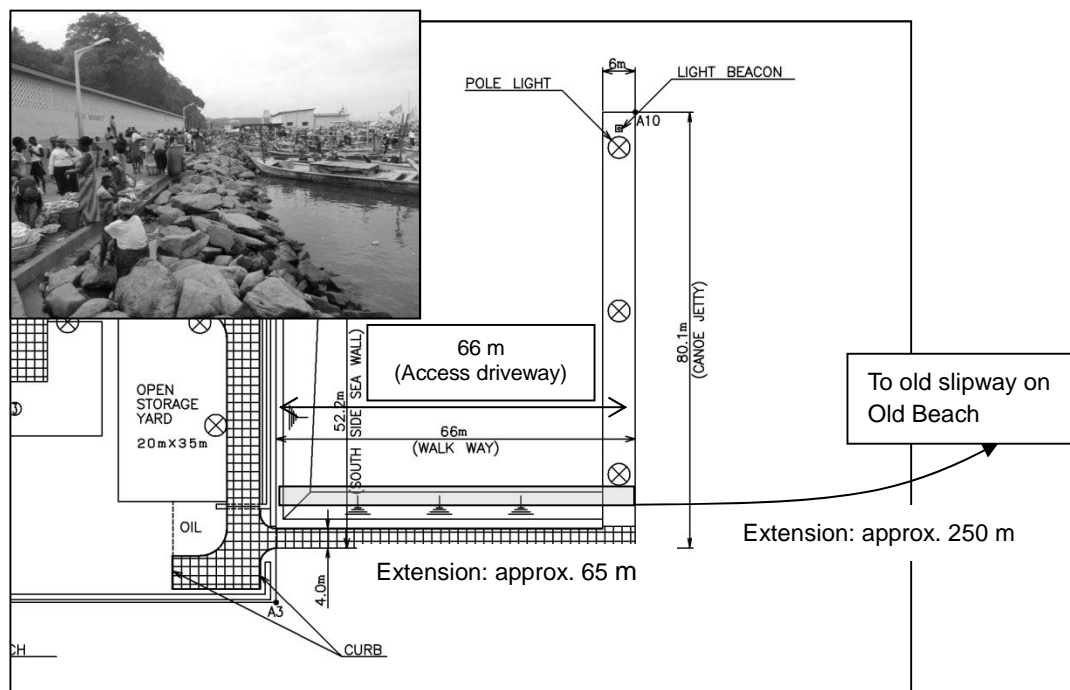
(10) Access Driveway behind Canoe Jetty Constructed in Phase I
